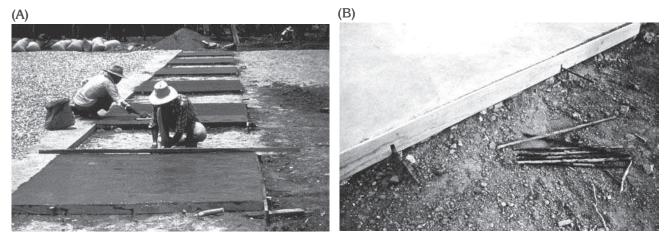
Expansion joints are placed between concrete slabs (A), together with iron rods (B).
